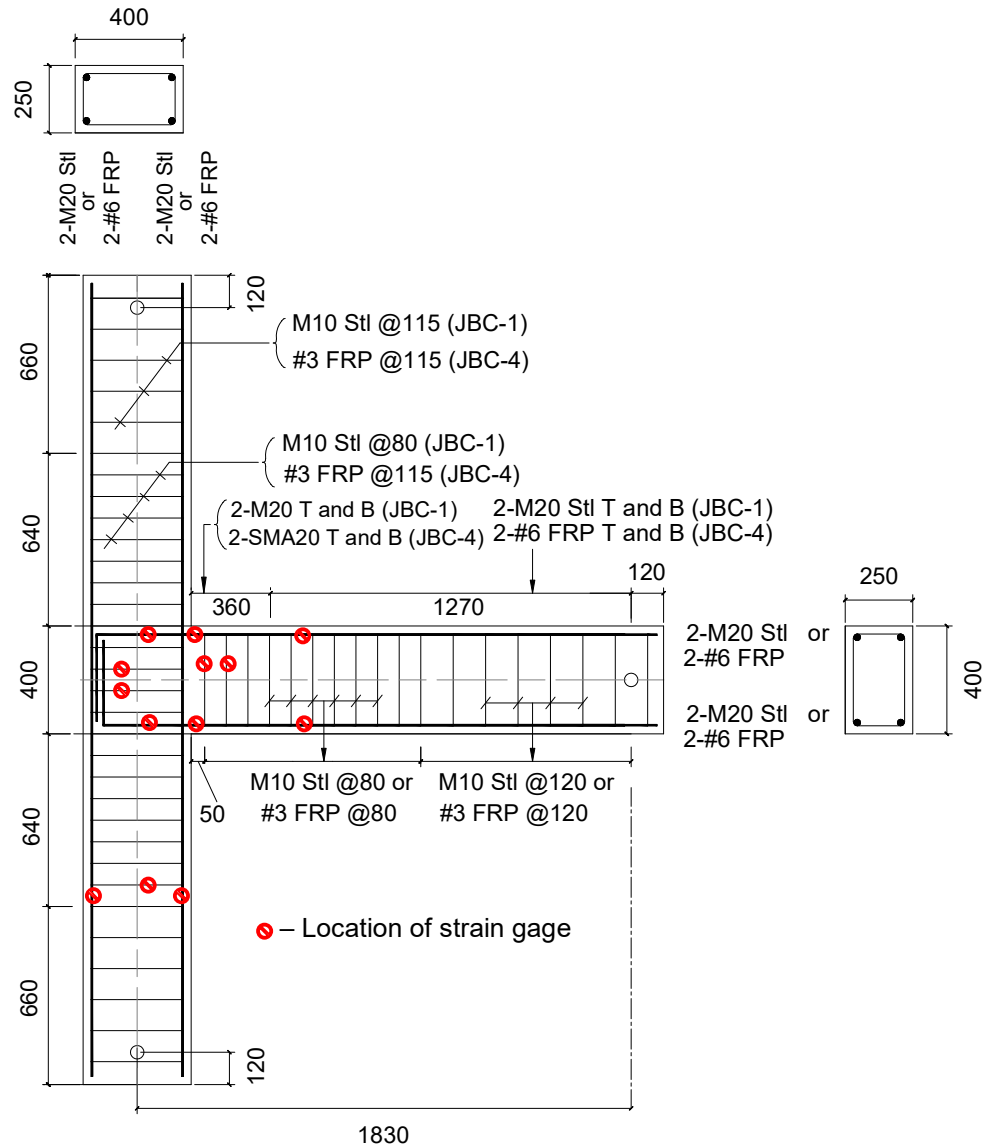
Reinforcement details of specimen JBC1 and JBC4 (dimensions in mm).
